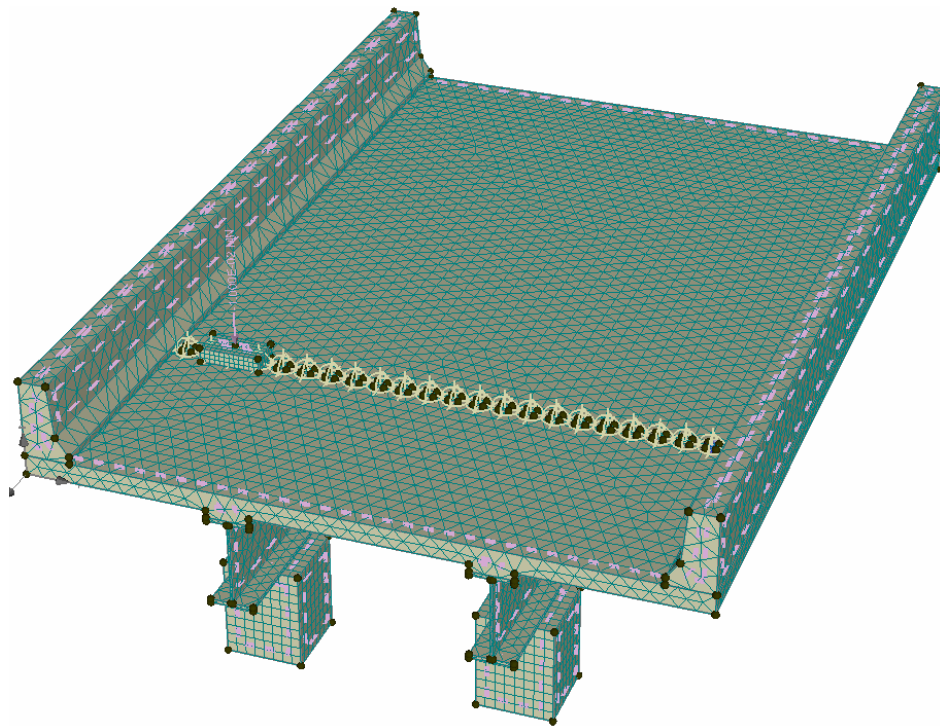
(d): Isometric view of finite element discretization for the cantilever sections
